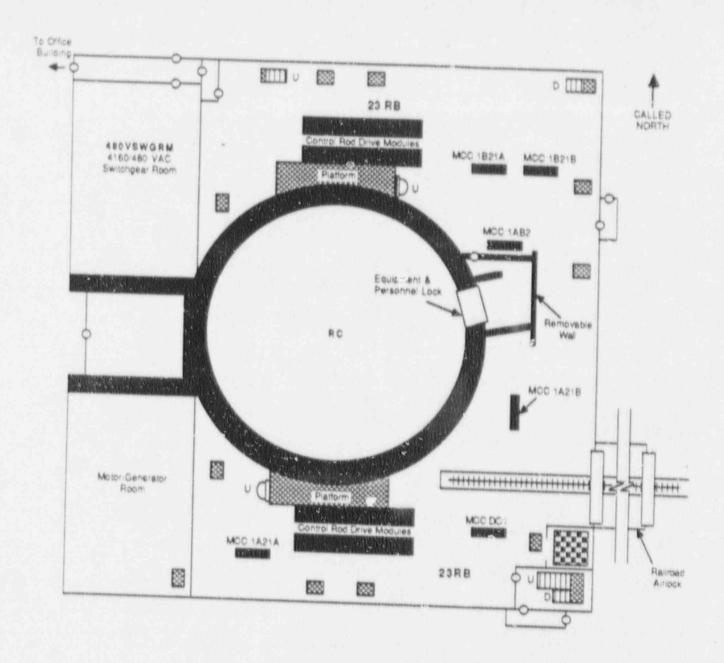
Oyster Creek Reactor Building - Elevation 23'-6"
